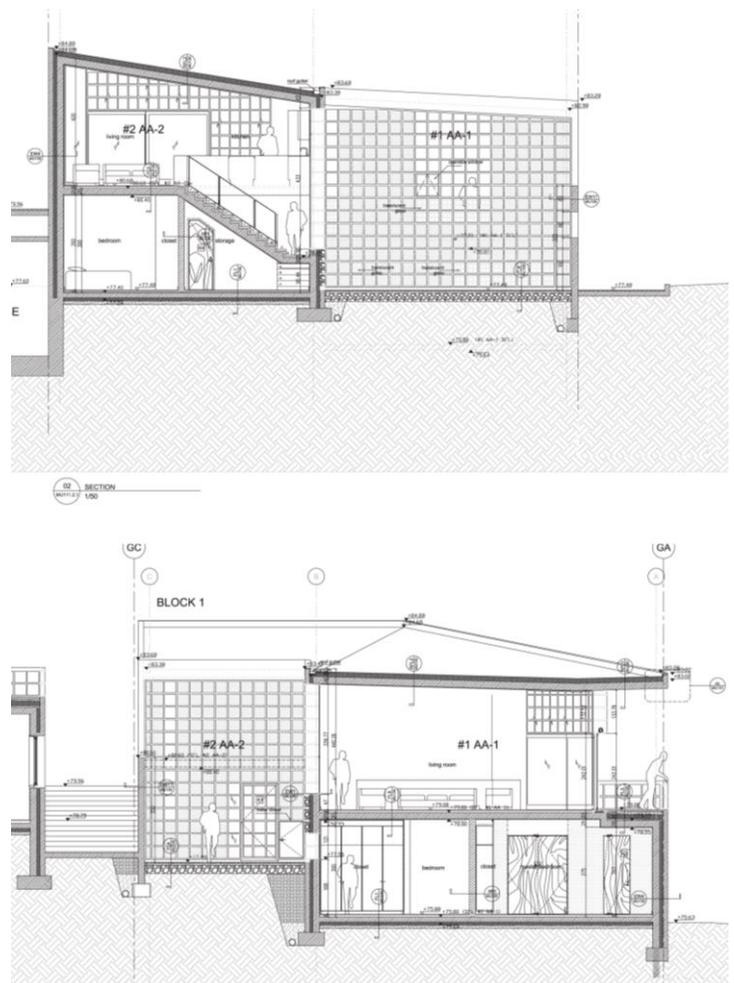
Sections through Holl's proposed Dense-Pak Village house (Images by Steven Holl Architects)
